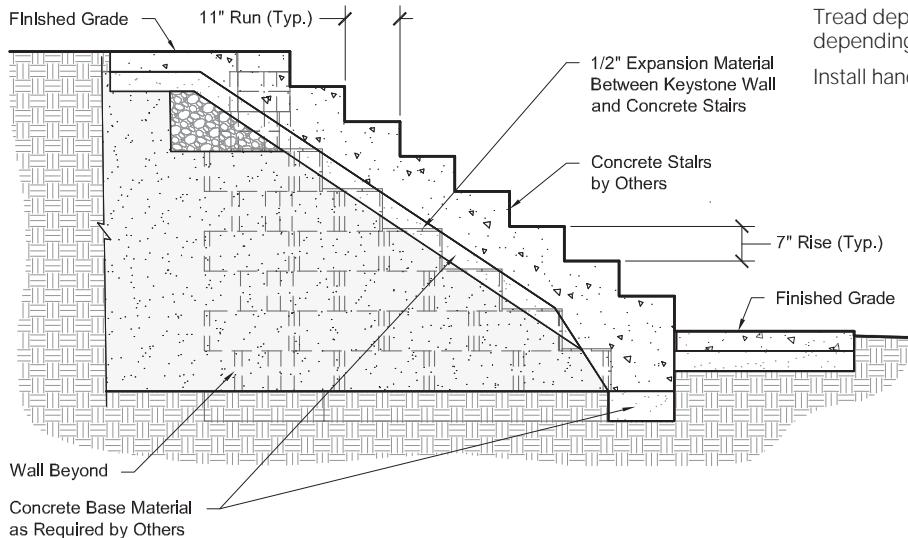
STAIR IN WALL DETAIL ELEVATION
